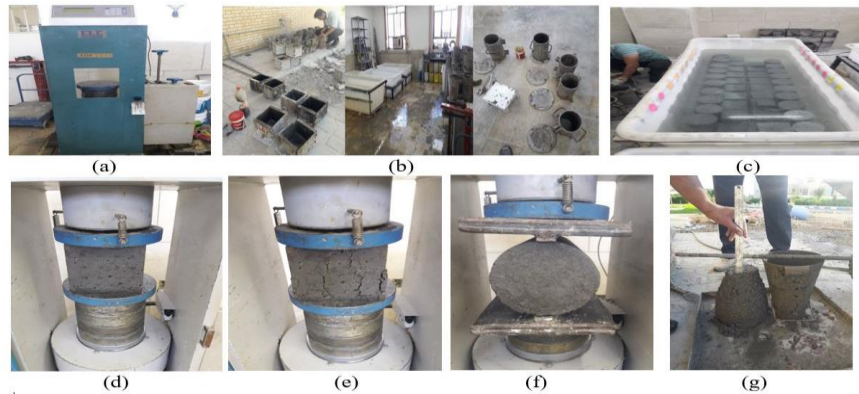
a) loading setup, b) lab equipment, c) curing condition, d) under loading sample, e) failure view of sample, f) tensile test and g) slump analysis.
